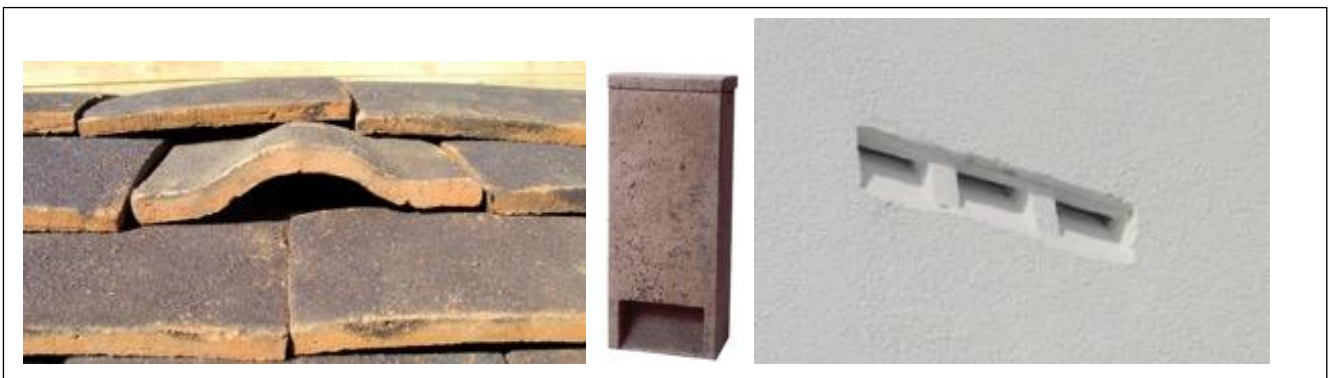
Examples of integral bespoke bat roosting features that may be incorporated into buildings during construction/renovation. From left to right: an example of bat access tile into loft space; the 2FR bat tube; and an example of 2FR bat tubes installed into a house wall in a series of three. Other brands and designs are available.
